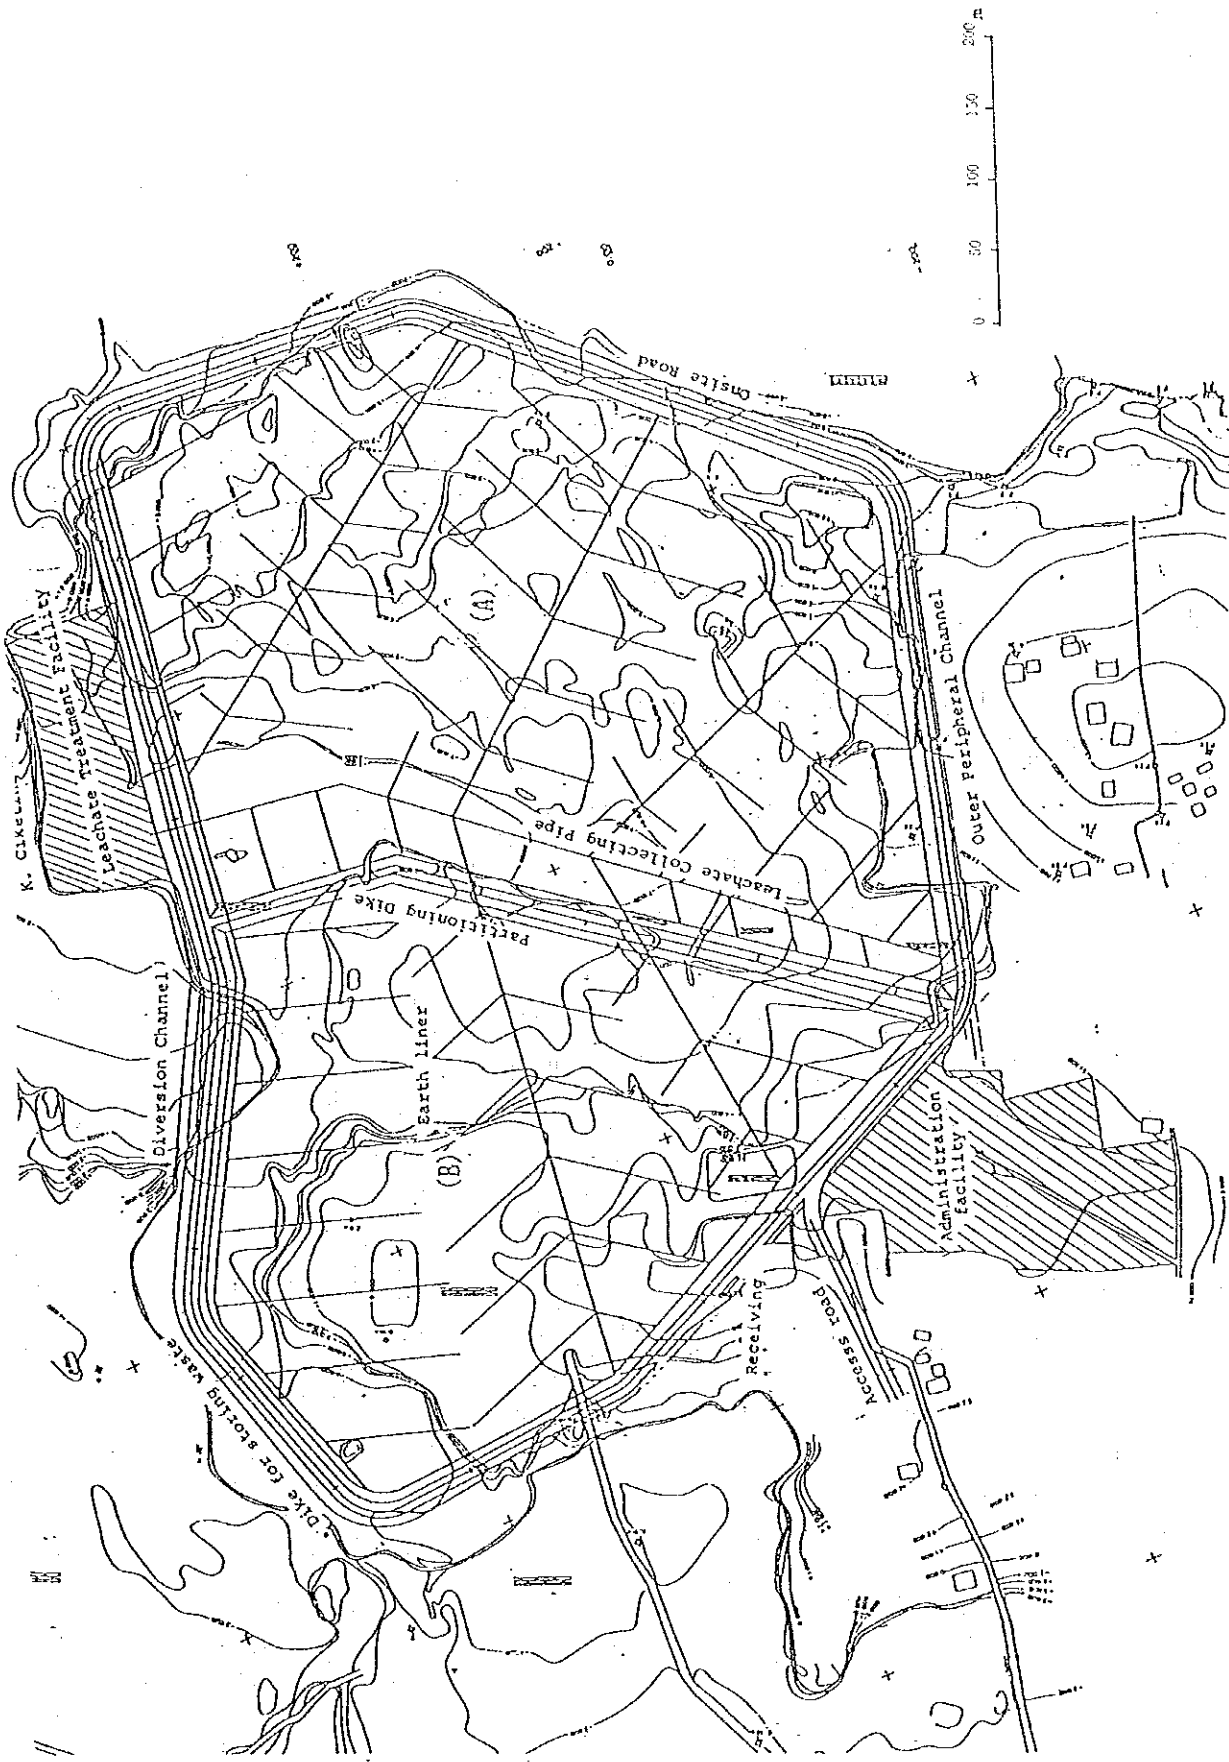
Layout Plan of Bekasi Final Disposal Site
